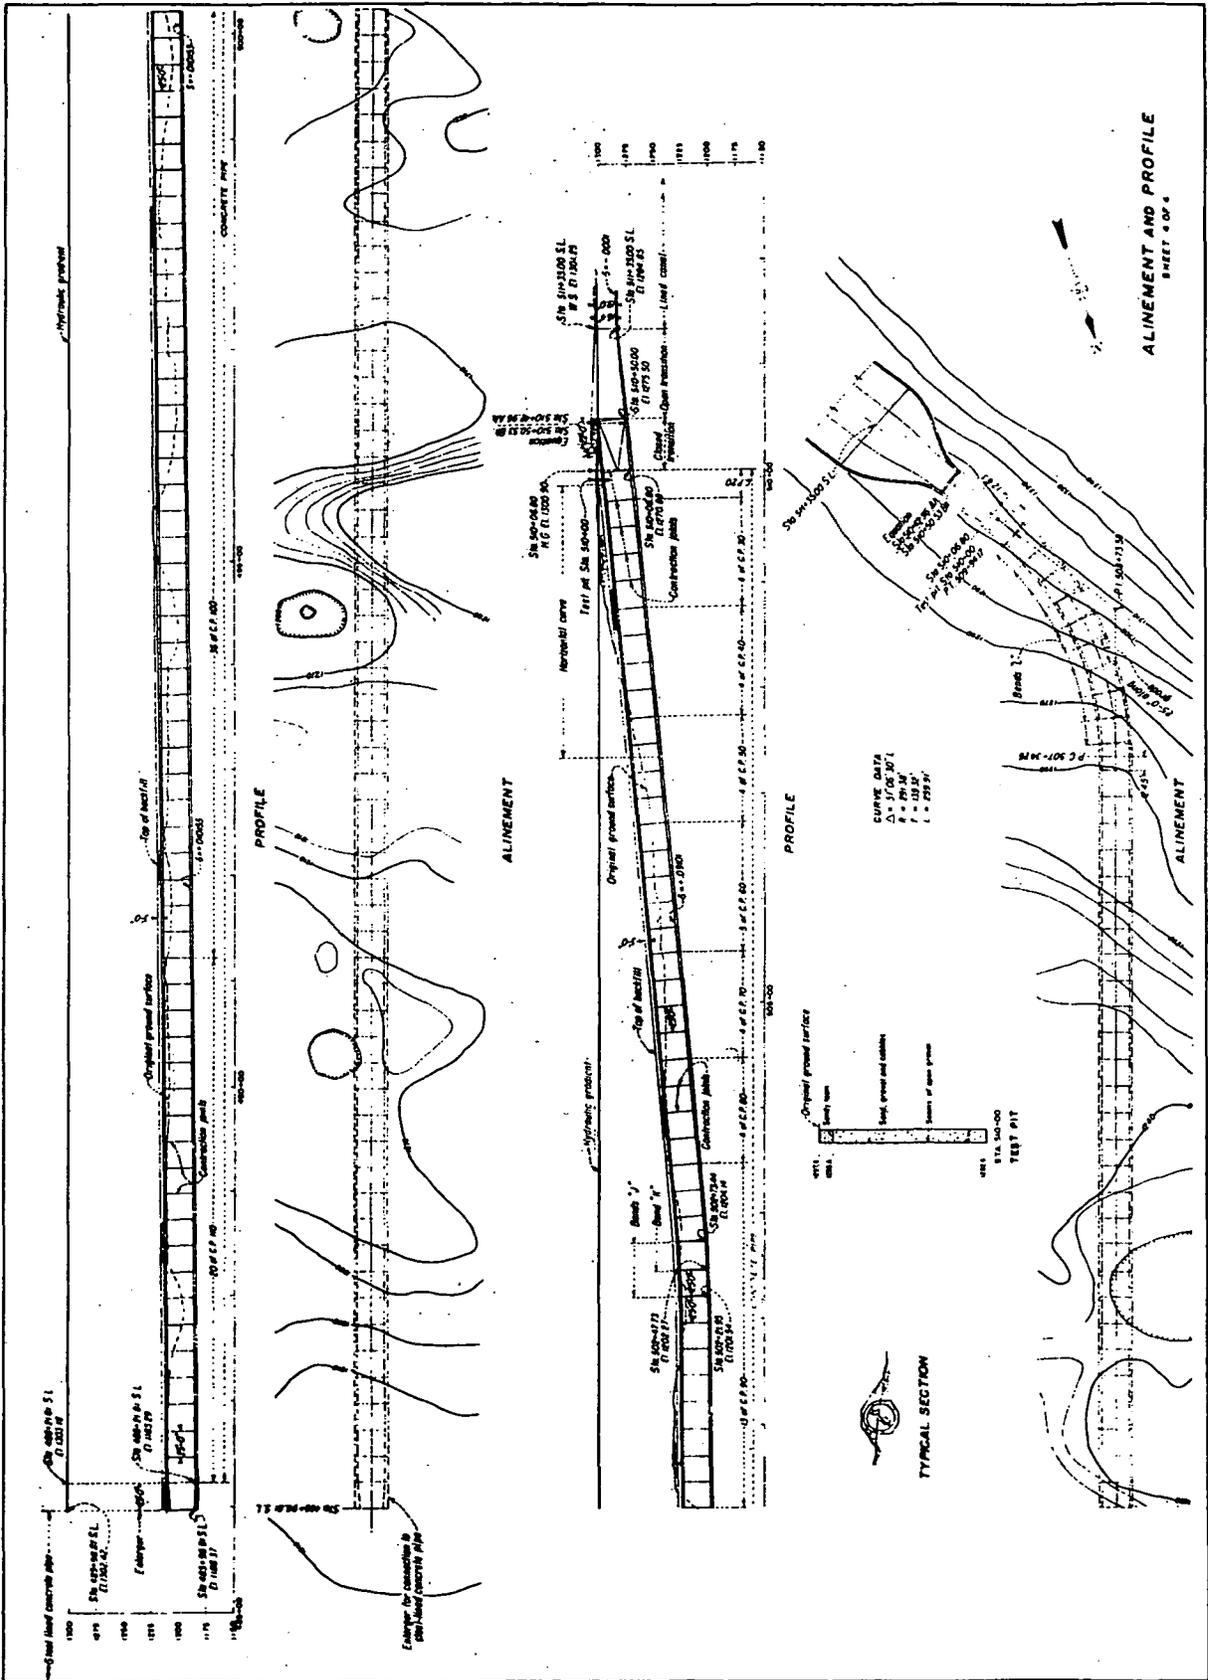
Alignment and profile of the steel-lined concrete pipe (Sheet 4).
